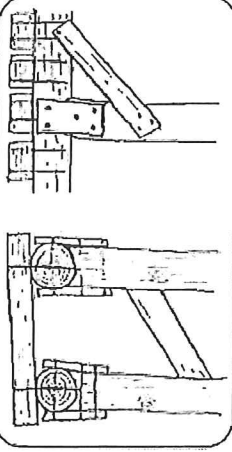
BRIDGE STRINGER SUPPORT AND CROSS BRACING
